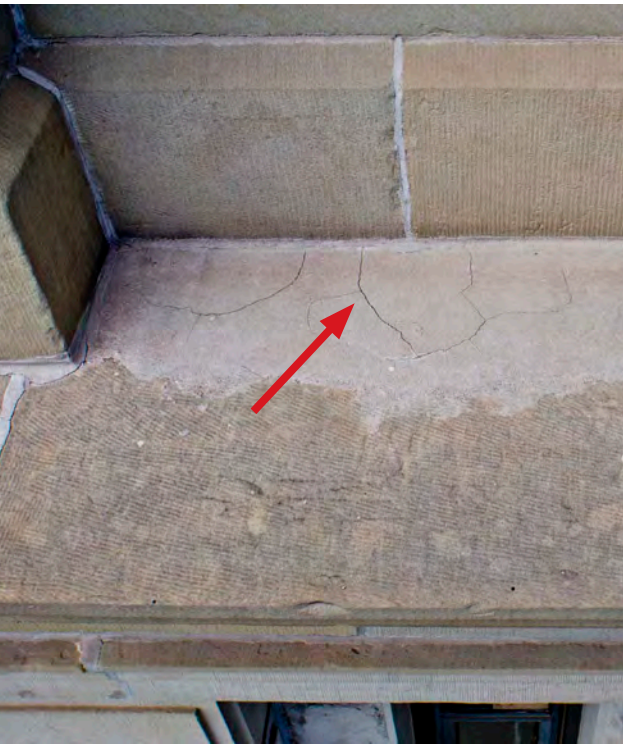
Cracked Patch Repair at the Cornice Below a Window at the South Elevation.
